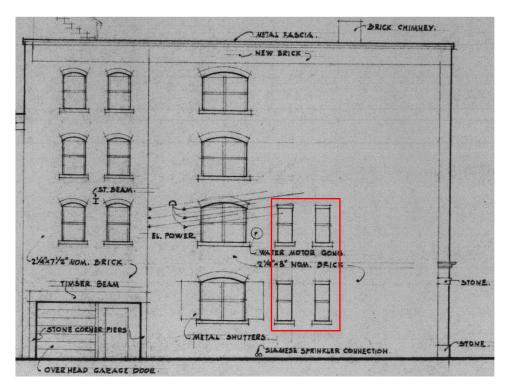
Detail of a 1977 architectural plan, showing four windows now blocked (red).⁸¹
